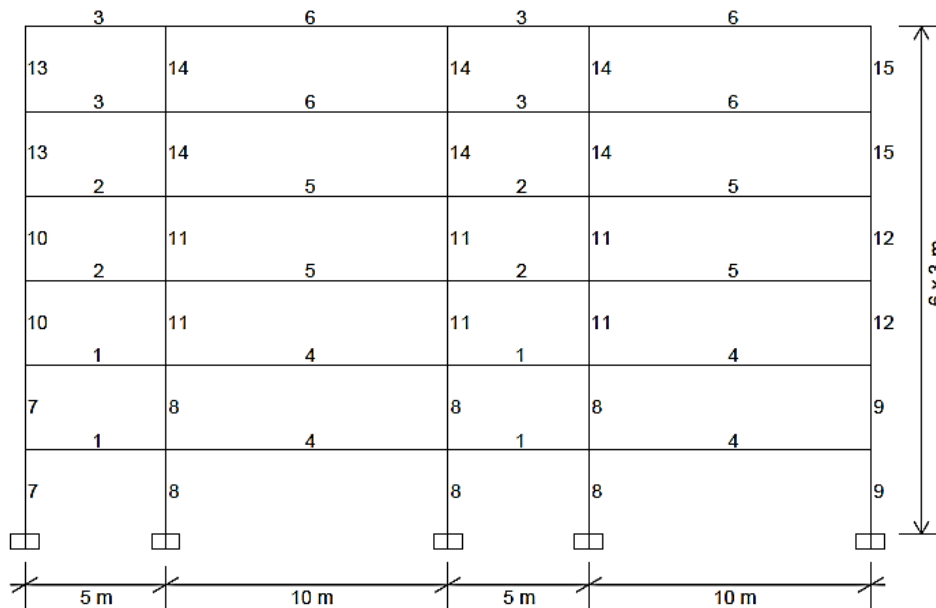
54-member planar OMRSF and grouping of structural elements
